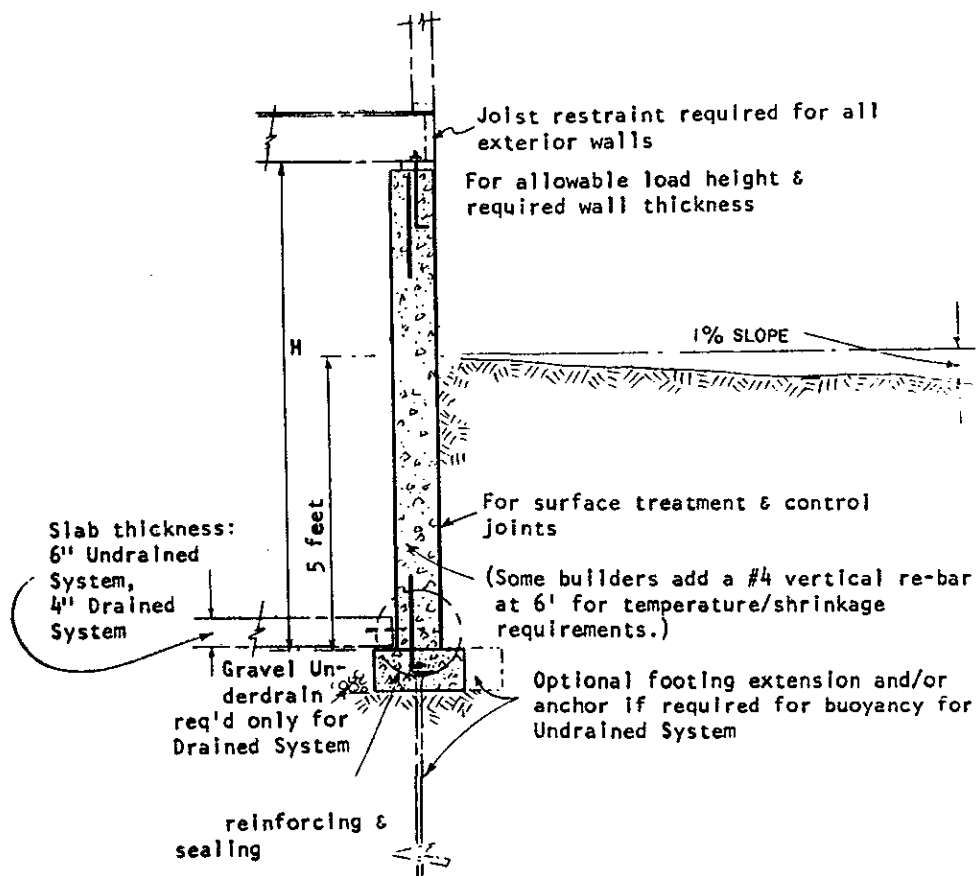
Unreinforced concrete wall design. (Reference 26).
